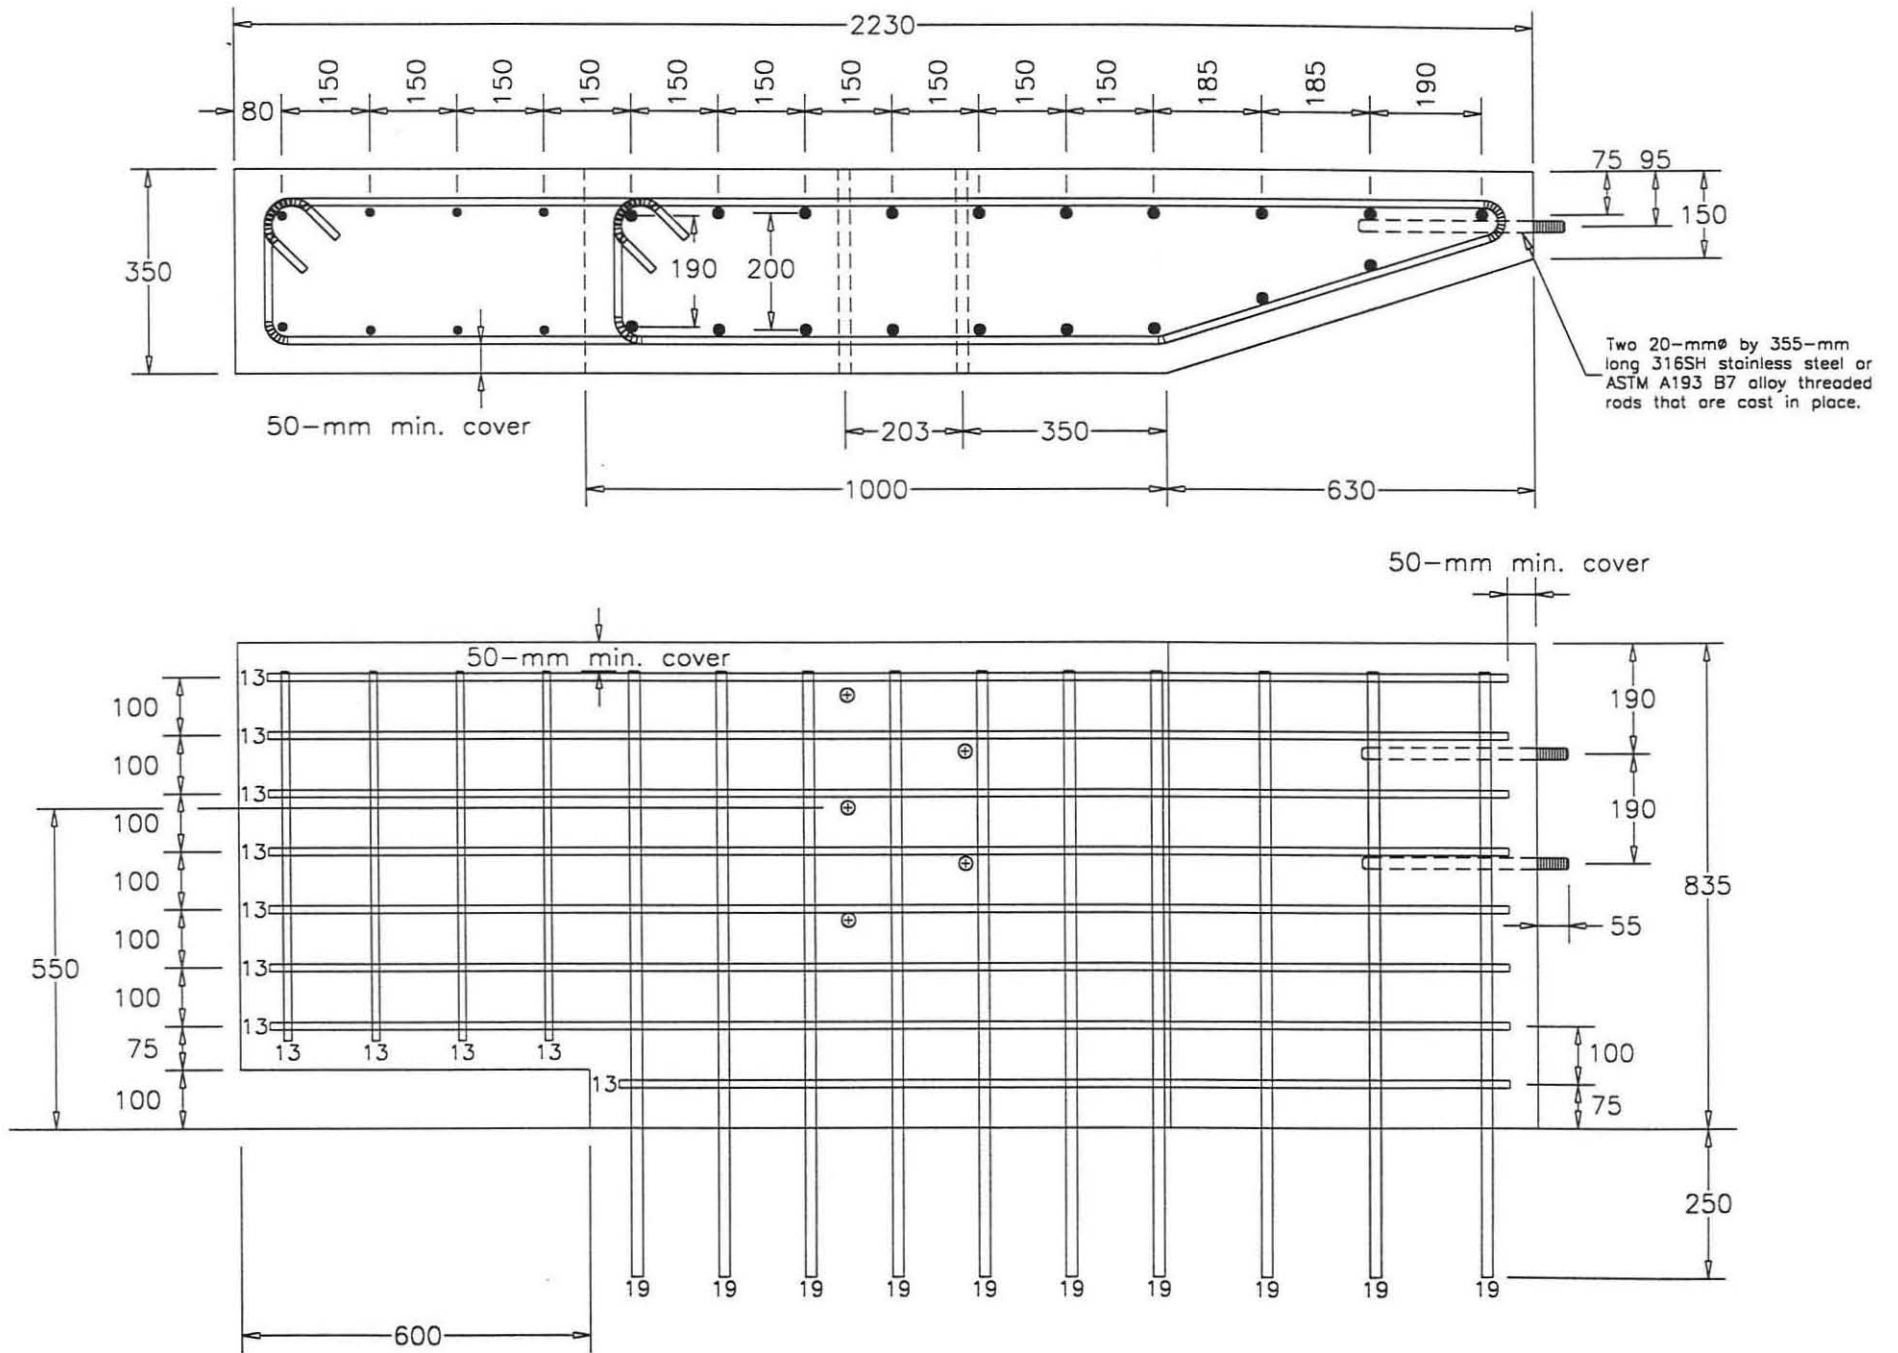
Concrete Buttress Details for Nested Thrie Beam Transition
